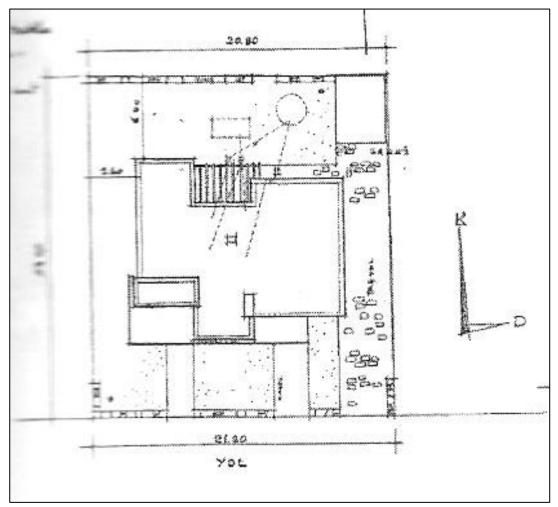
Tangül Family Residence Project Site Plan (Feridun & Feridun, 2013)
